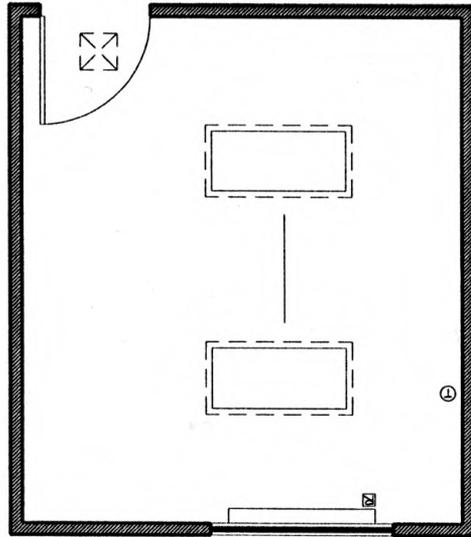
Plan of Independent Living Work Area - Site 1.
